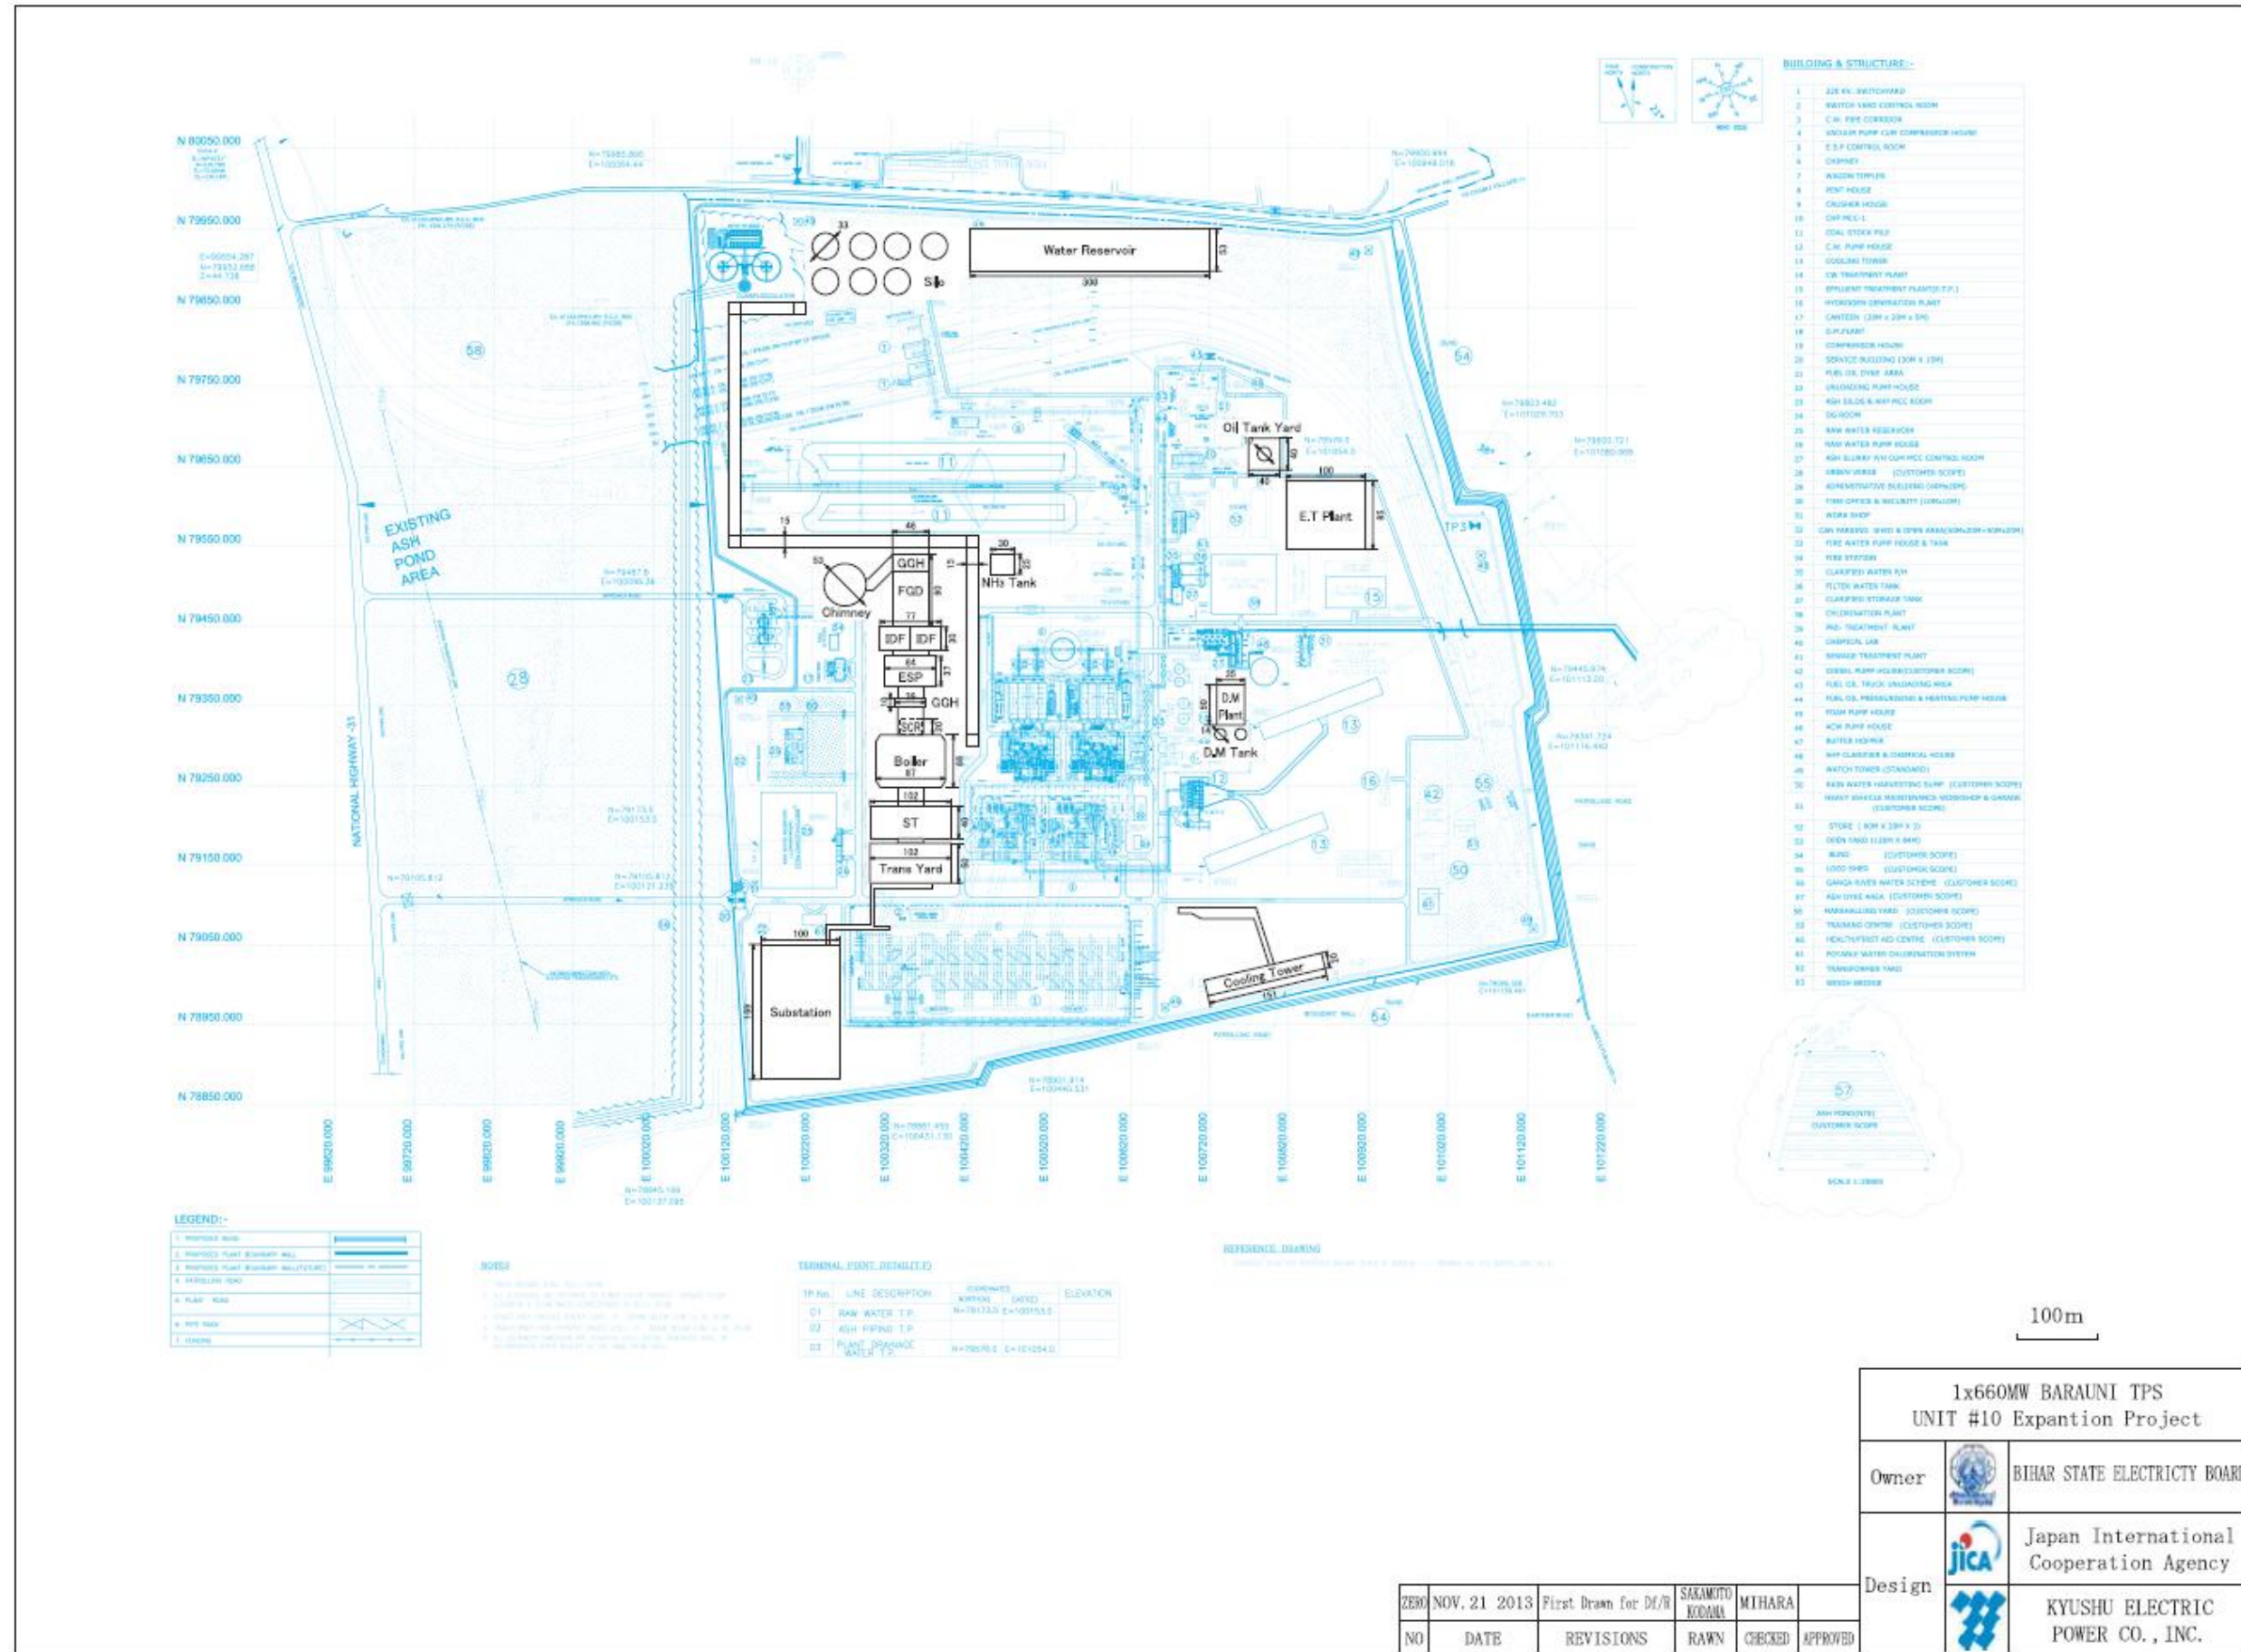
Configuration Adopted in Japan in Planned Site of Unit No.10
